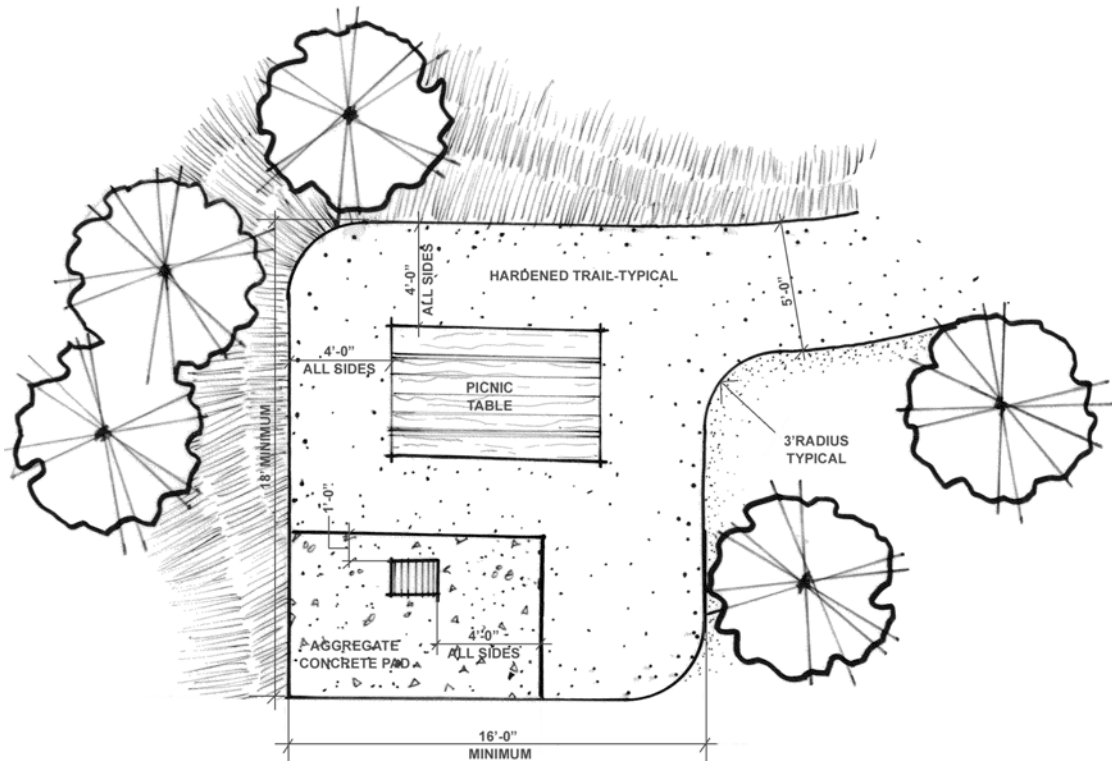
TYPICAL PICNIC TABLE LAYOUT
